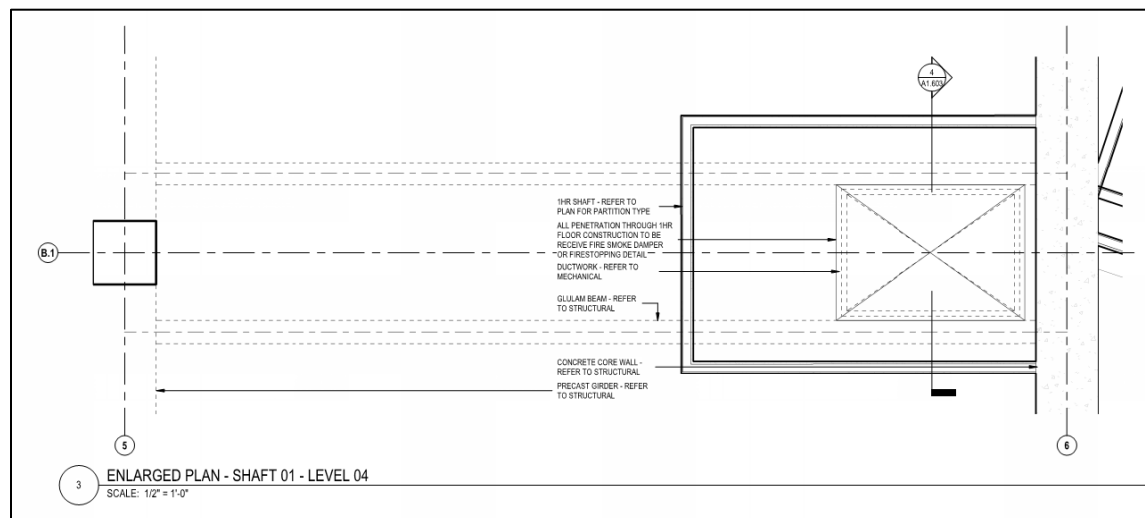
Plan view of vertical opening in shaft between Floors 3 and 4.
